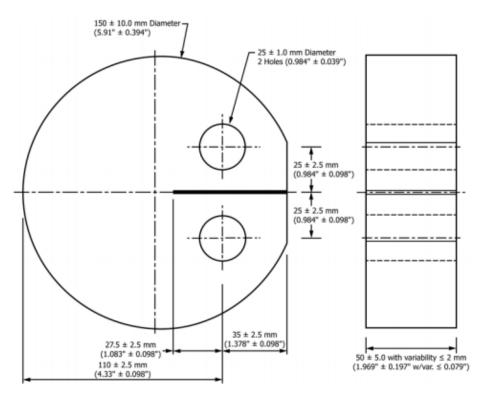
DC(T) specimen dimensions (ASTM D7313-13)
